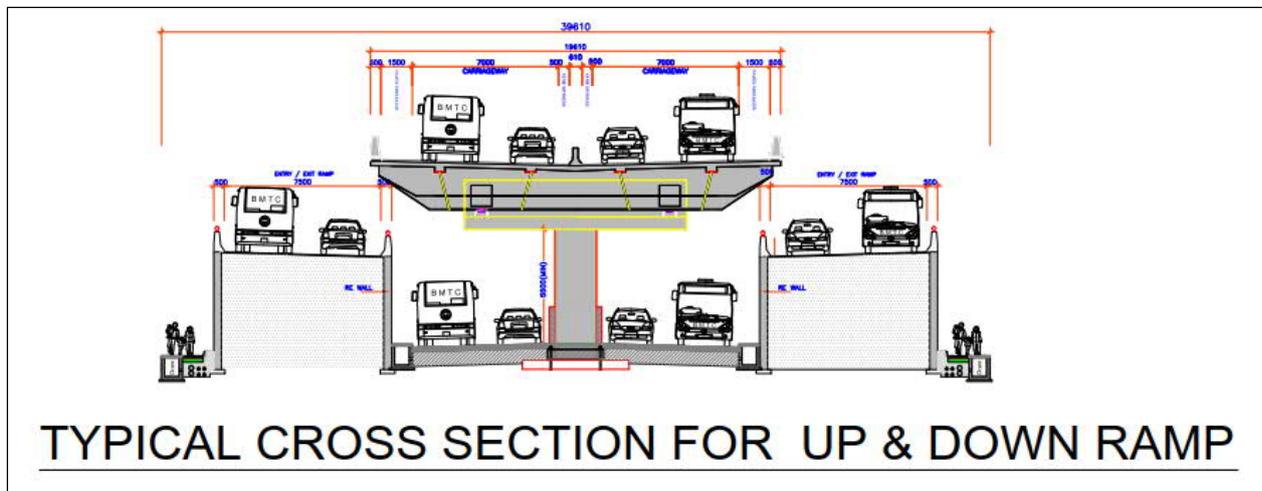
Typical Cross Section for up and down ramps of elevated corridor
